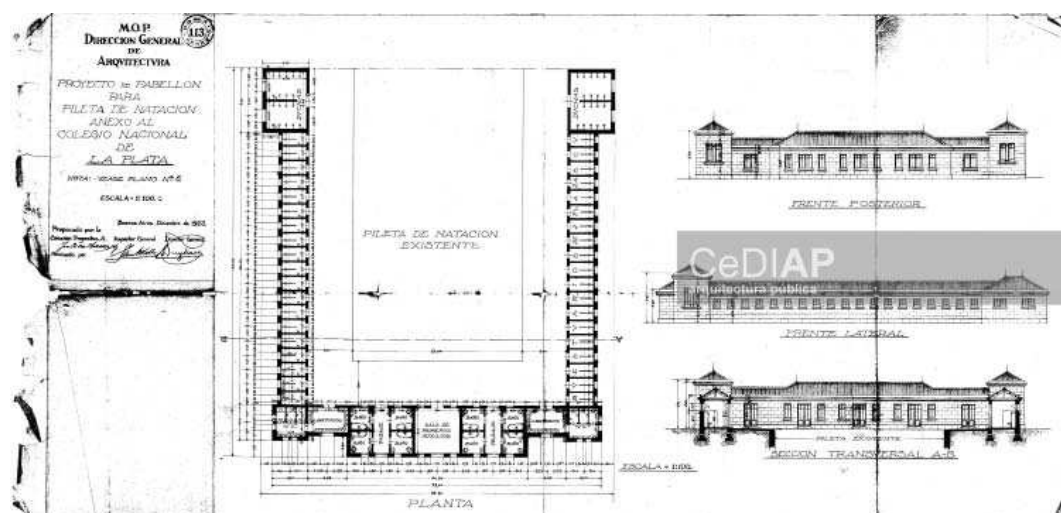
Project for a Swimming Pool Pavilion. Floor plan and sections. Archive of the Public Architecture Documentation and Research Center –CeDIAP- of the Ministry of Economy and Public Finance.
